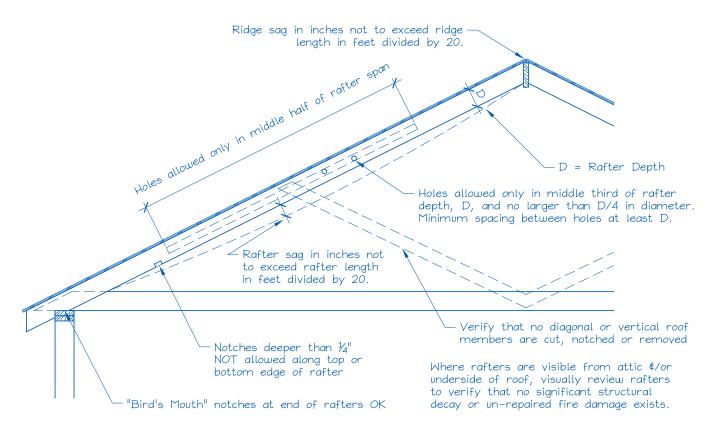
Roof Visual Structural Review (Contractor's Site Audit) of Existing Conditions.
